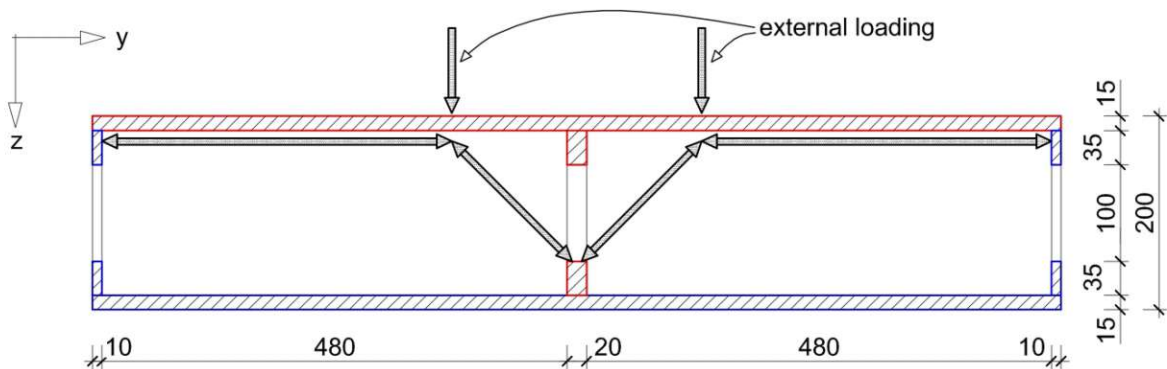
The planar truss frame model illustrates the load transfer to the central shear connector from the external loading
